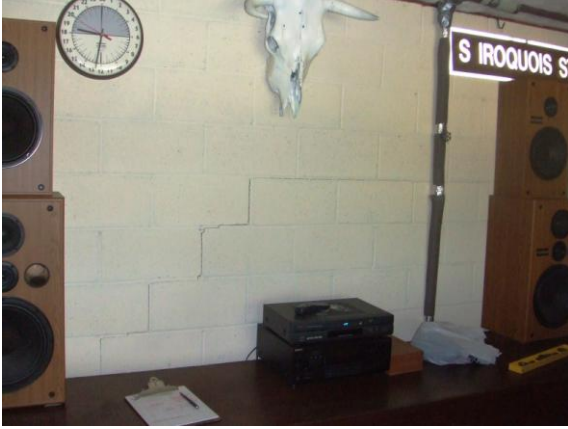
Stair-stepped cracking in CMU wall of basement-level garage.
